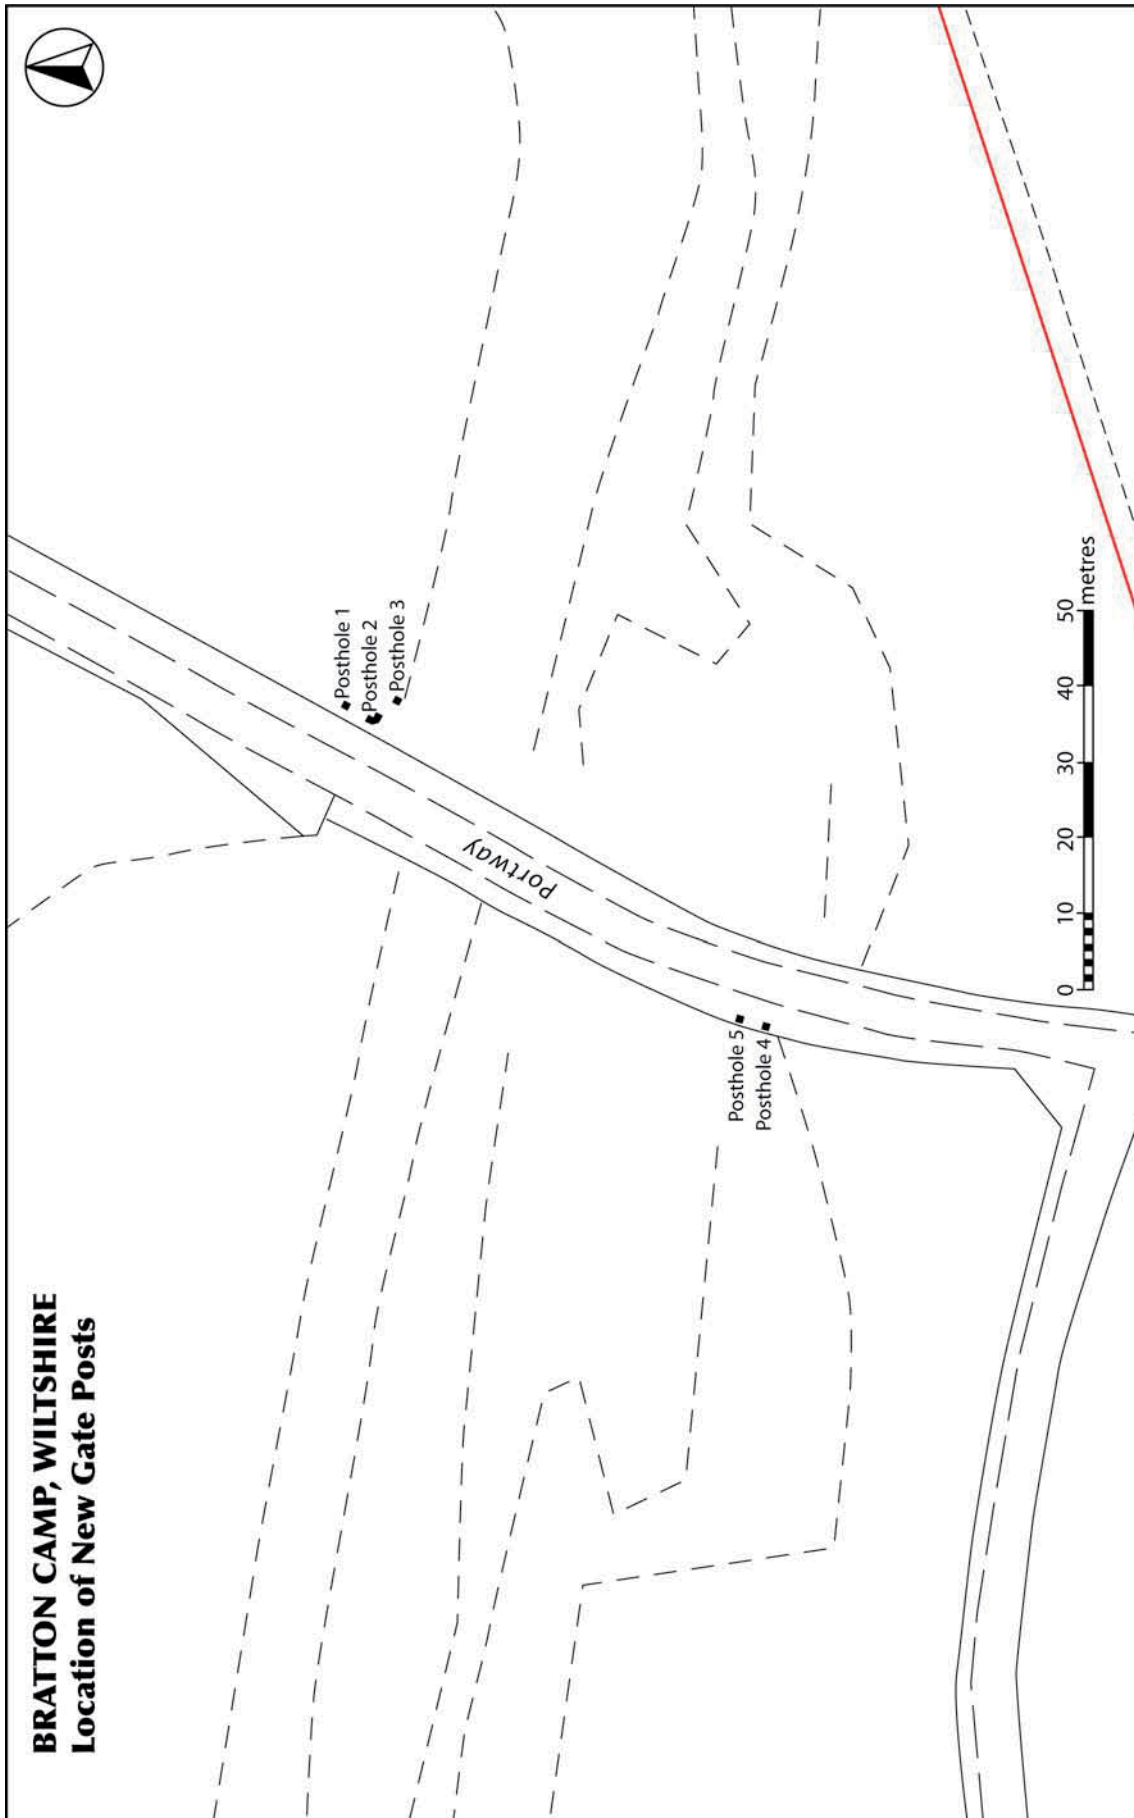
Plan showing location of postholes (based on a plan provided by the client)
